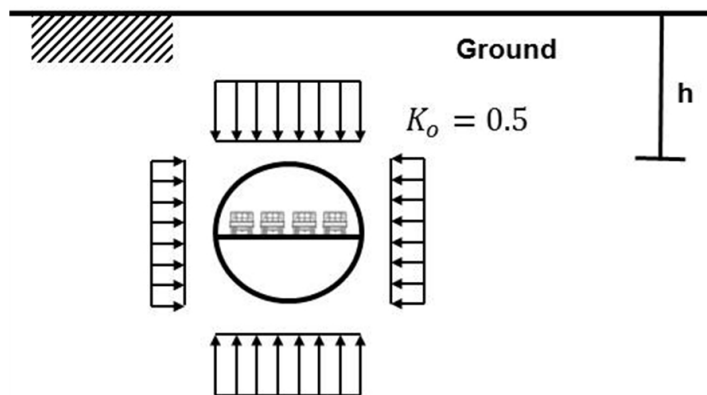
Load condition of Beam-Spring model for double-deck tunnel
